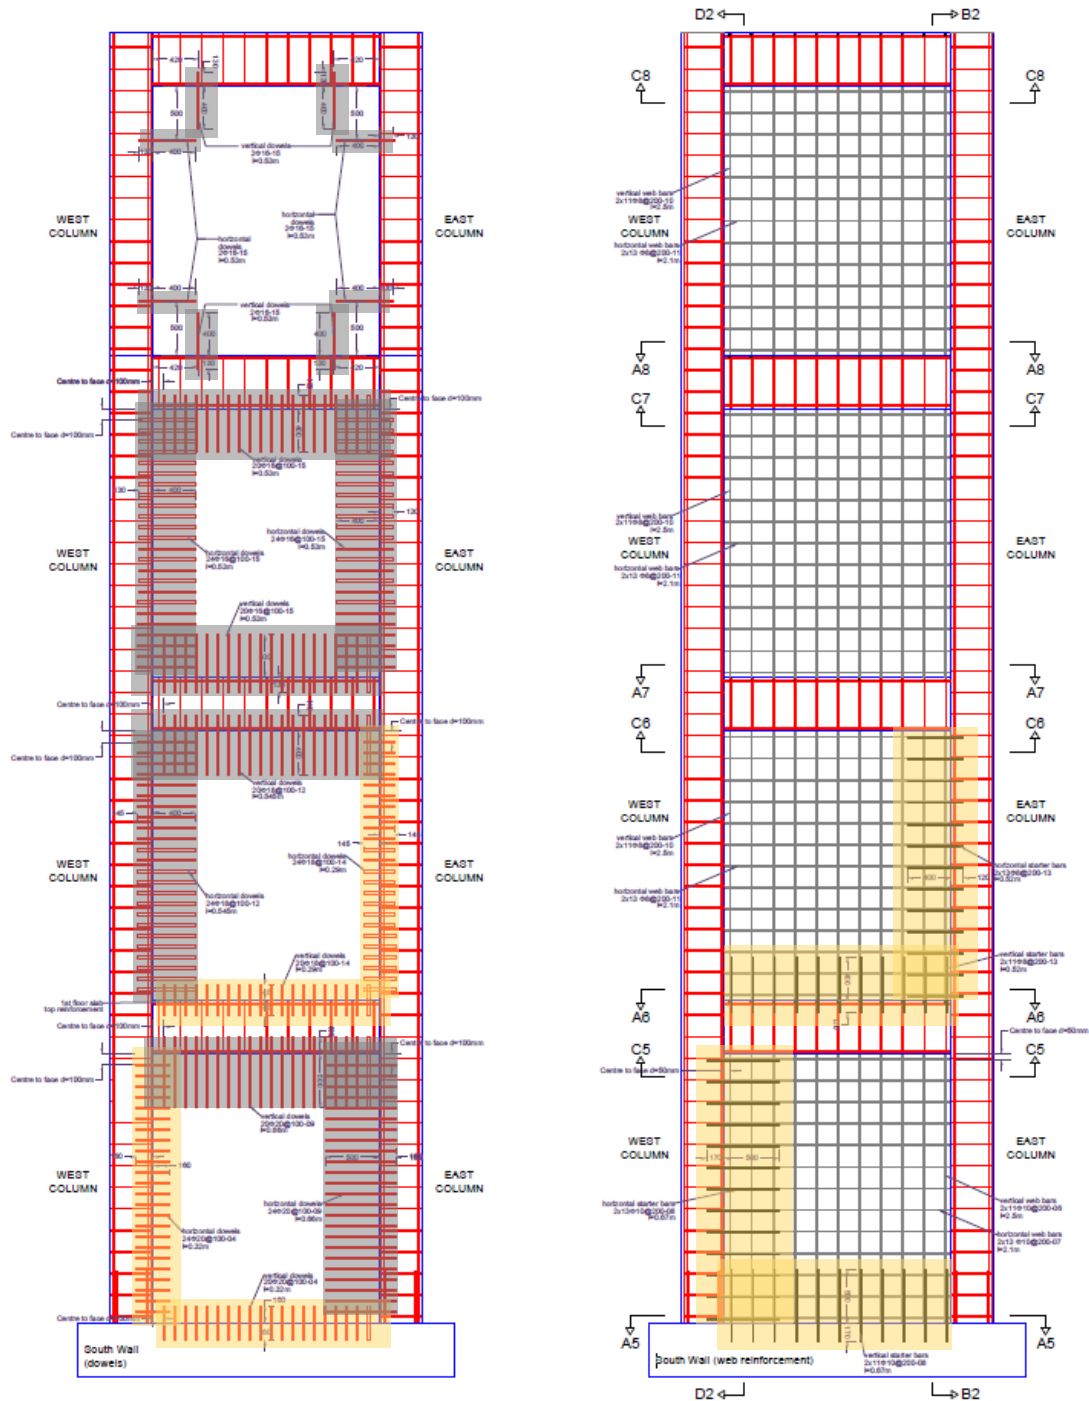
First and second connection details of the new infill south wall to the bounding frame. Additional retrofit was applied to reinforce the edges of the wall on the lap length at the ground floor based on the performance of the ground floor RC infill walls during the experiments. So, three-sided carbon fiber reinforced polymer (CFRP) jackets were applied to reinforce the edges of the wall at the ground floor with a height of 0.6m, since the lapping stop at 0.55m from the base of the column as it is shown in Figure 3.7. This
